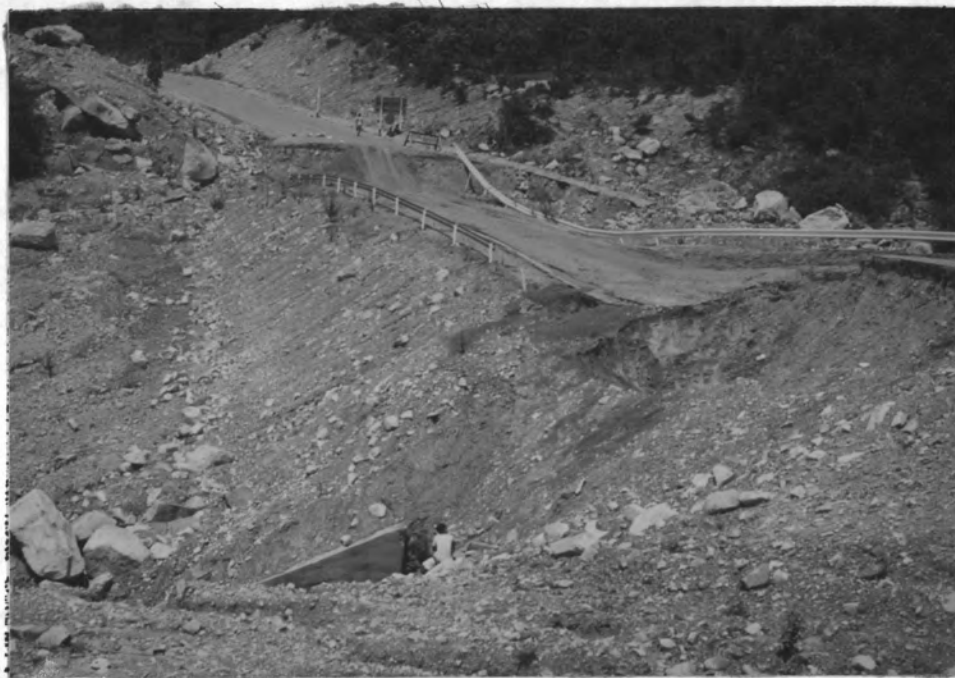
First failure on the embankment and box culvert between KM. 12.650 and KM. 12.750 in 1981. The photograph was taken looking uphill toward Khao Yai National Park.
